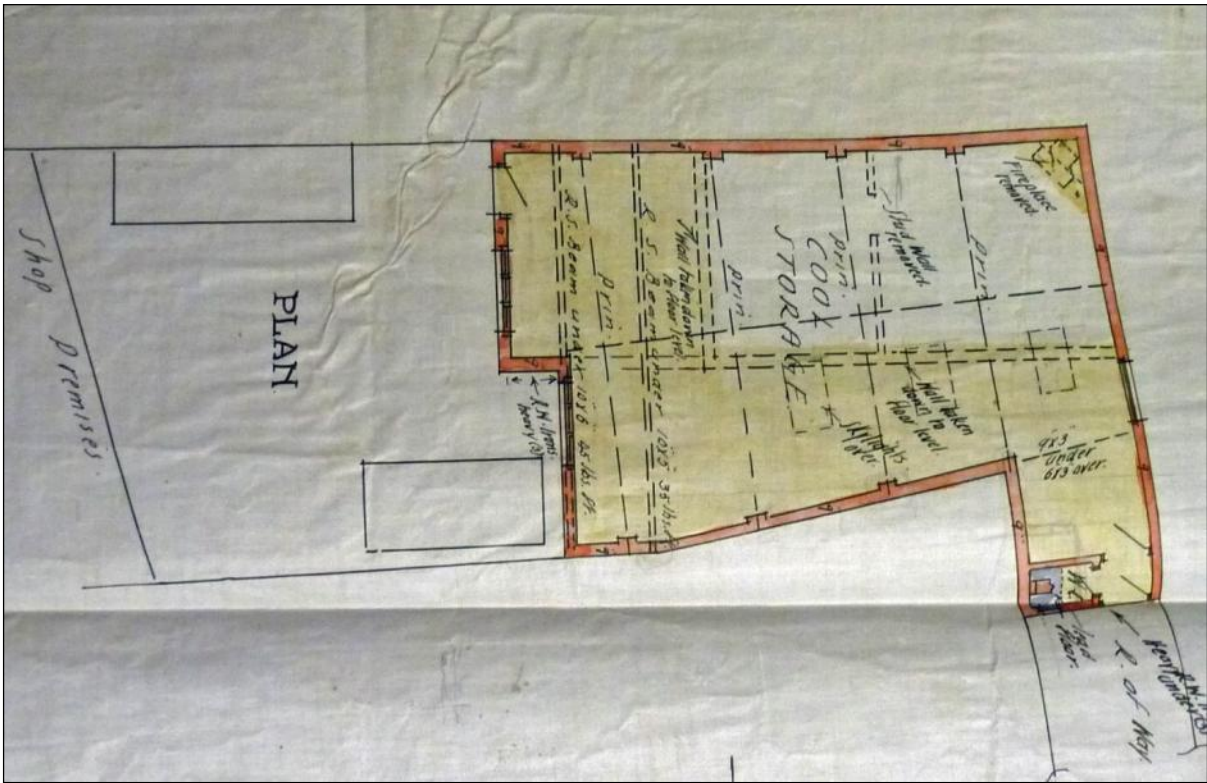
1925 floor plan for expanded cool store area at Scholz's butchers (TAHO, AE417/1/935, 147 Elizabeth Street).
